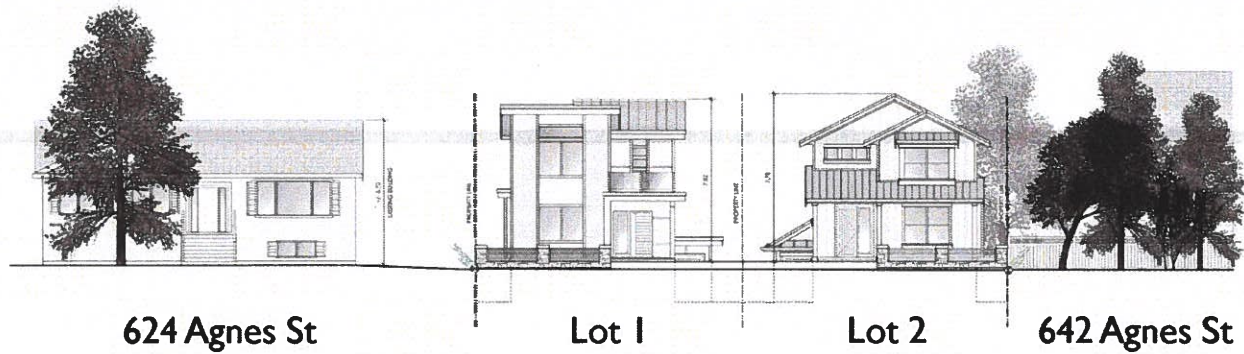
Streetscape Elevation (from plans by Victoria Design Group)
